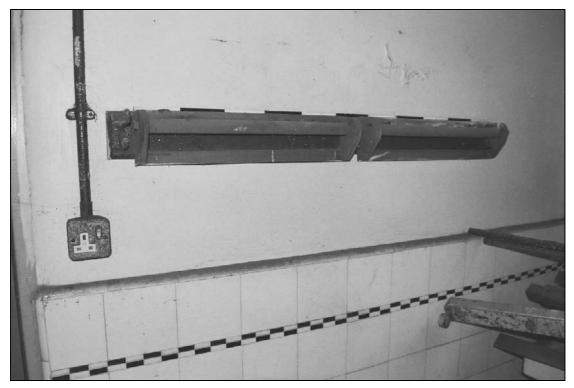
Detail of tiling, G13, wash house (film 44.1)
